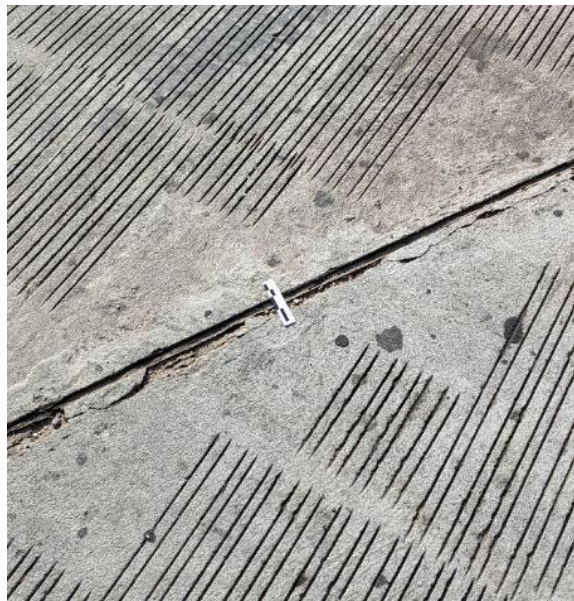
(h): Cracking and spalling observed on closed joint at Bent 3 (Construction Stage I)
